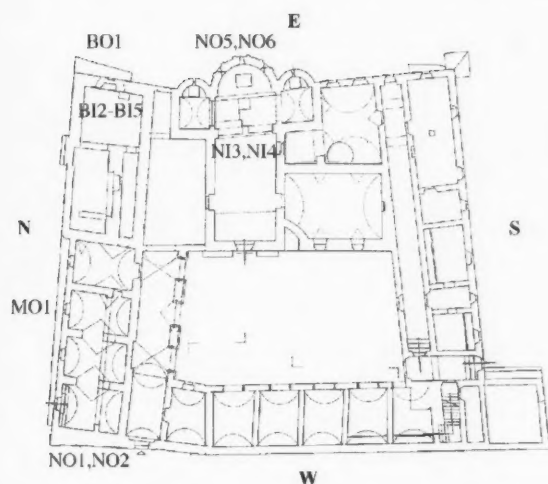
Plan of the monastery and sampling points. B, Byzantine; N, Norman; M, Modern; I, Inside; O, Outside.
